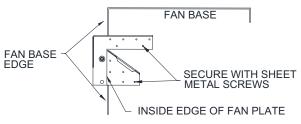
Typical Hinge Kit Fan Plate and Curb Plate Details
